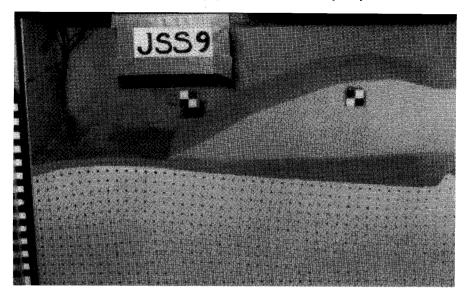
Failure of a geogrid-reinforced embankment (test JSS9).
